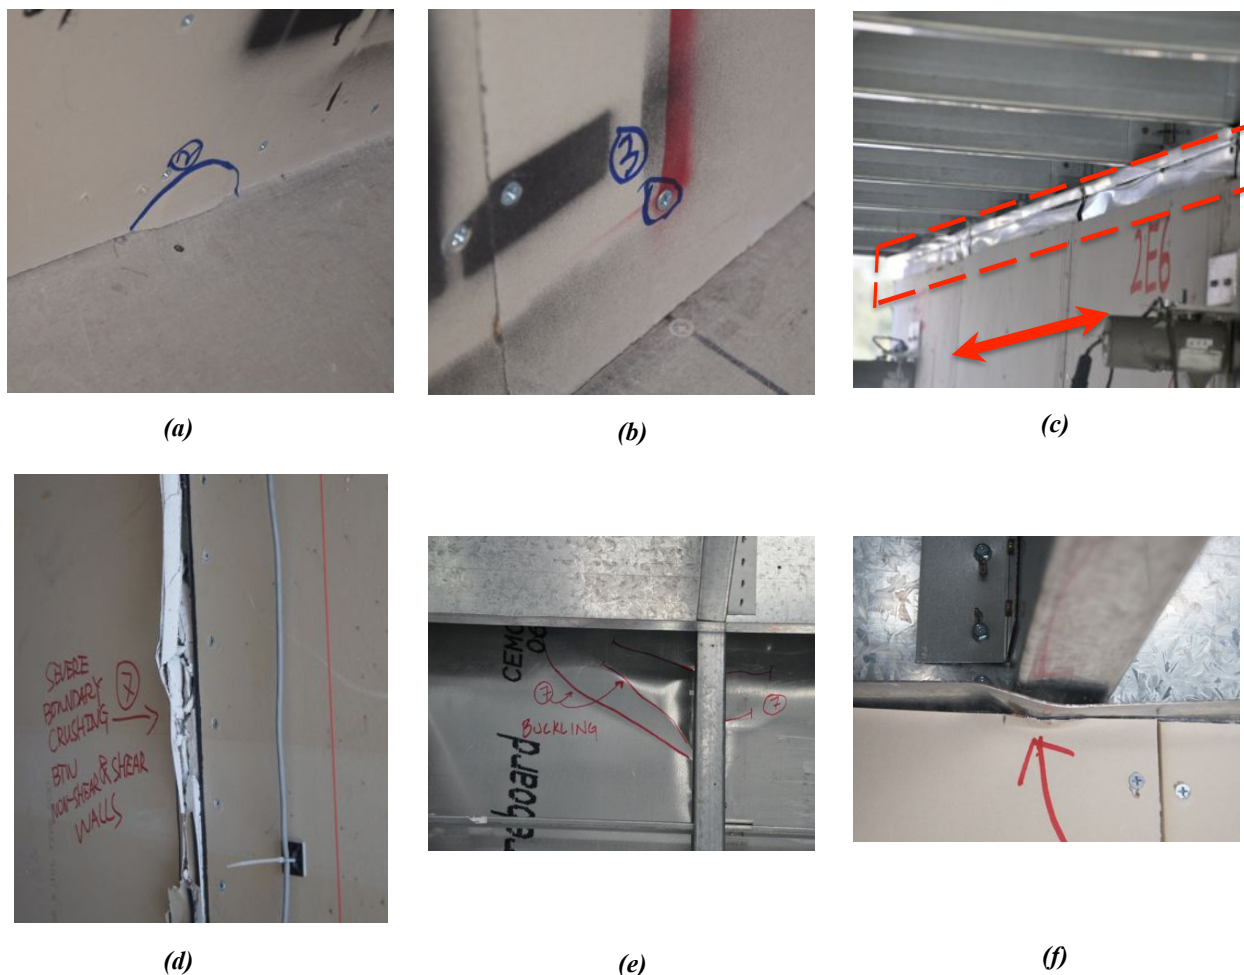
Damage to the test building during the pre-fire earthquake test sequence: (a) gypsum bulging on the bottom edge (EQ2), (b) gypsum screw popping (EQ3), (c) buckled sheet steel of corridor shear wall at level 1 (EQ6), (d) sheathing panel crushing between the shear wall and gravity wall at level 4 corridor (EQ7), (e) buckled composite panel sheet steel of corridor shear wall at level 4(EQ7), and (f) buckled rim track flange above gravity wall at level 4 (EQ7).
